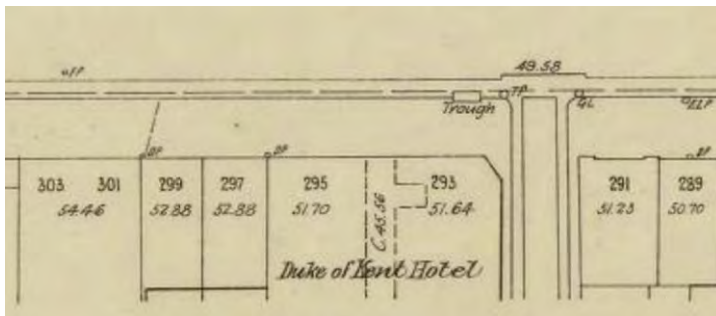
An 1895 plan of the original Duke of Kent Hotel. (Source: MMBW Detail Plan no 1024, 1895, SLV)
